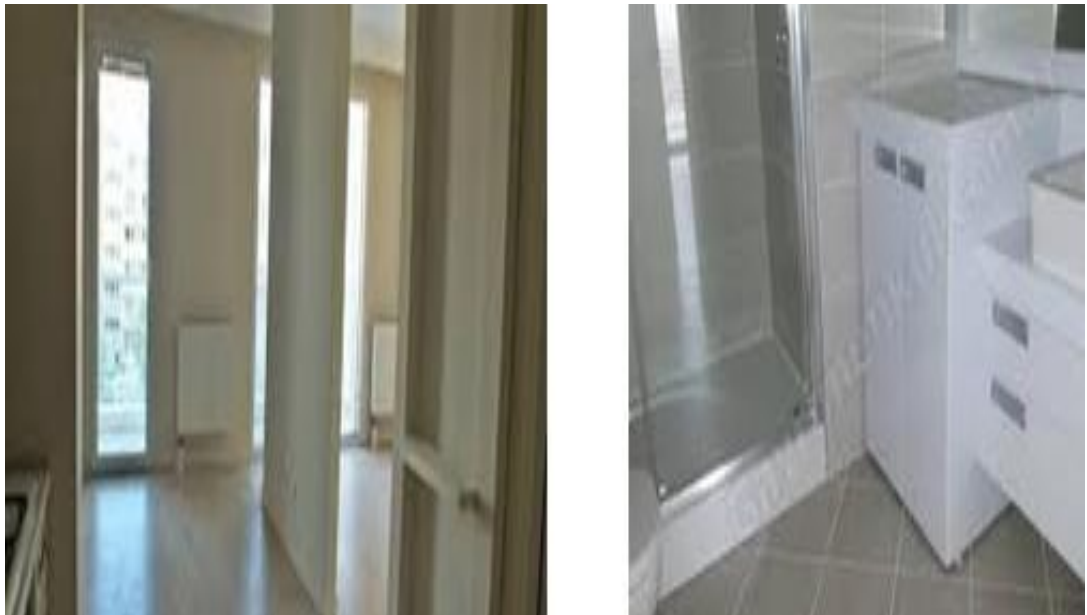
The local material used at kitchens and bathrooms at Mavisehir
